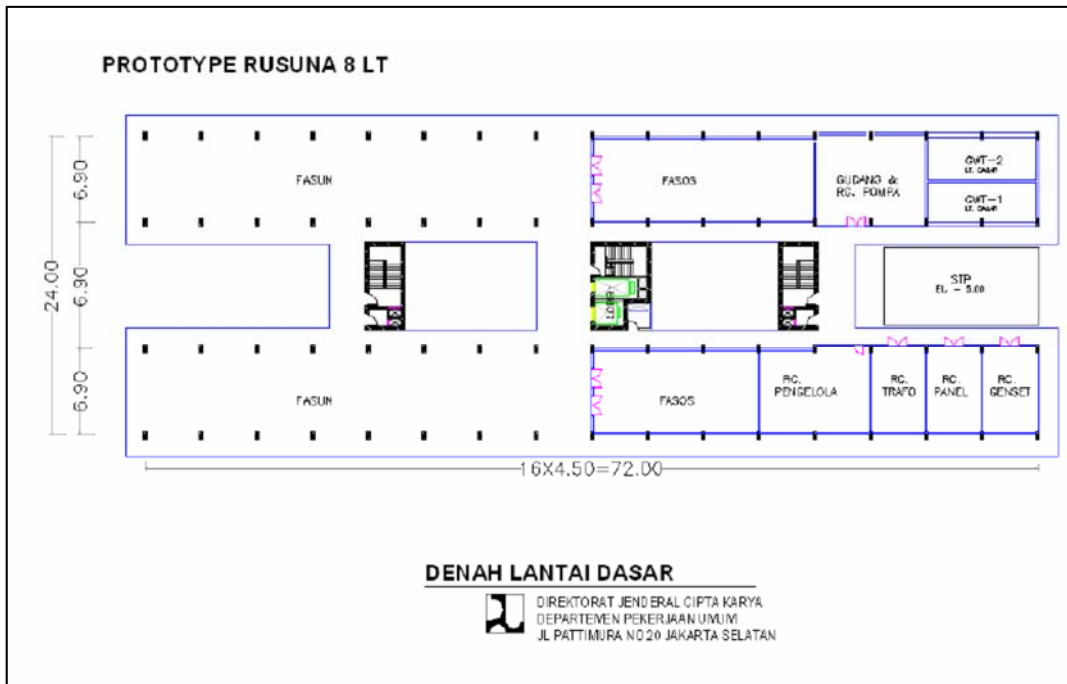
Symmetric Parallel (SP) Model Plan for 8 floors Rusun
